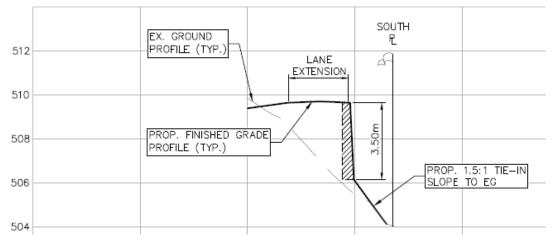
Over-height retaining wall No. 2, section drawing (green).
